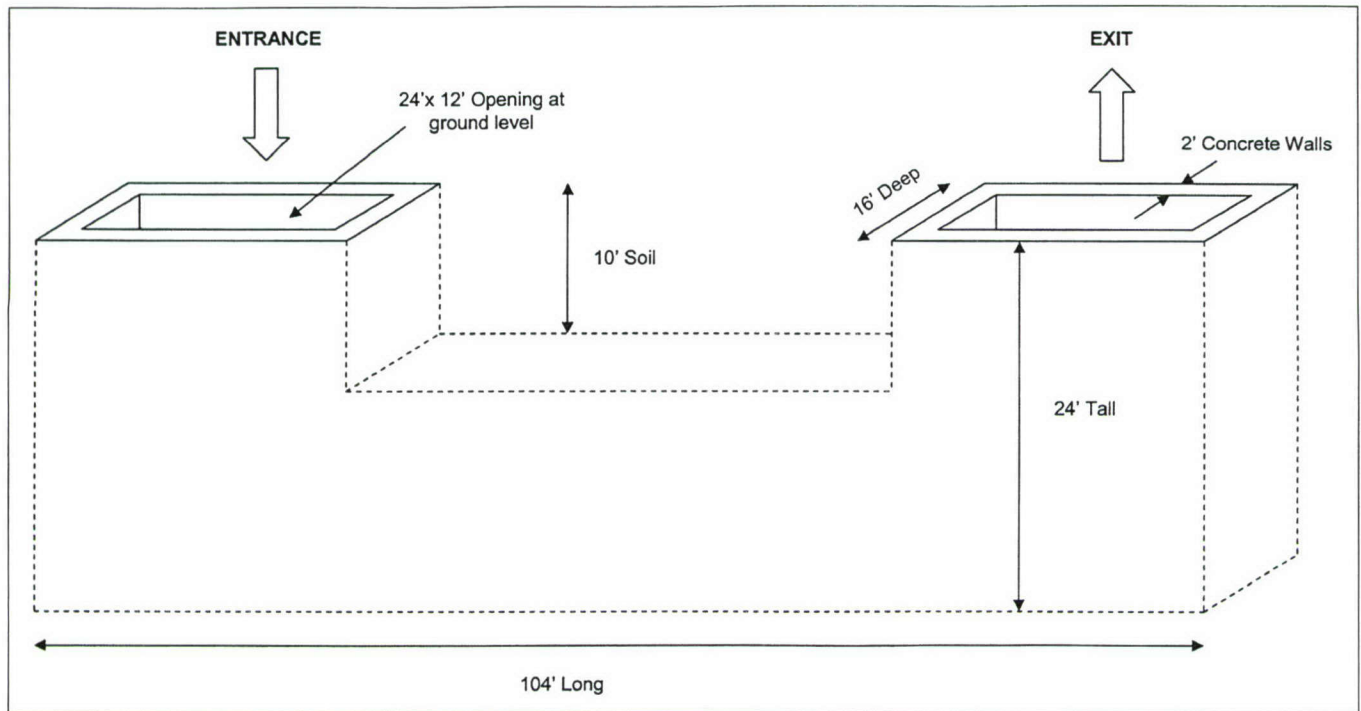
Side perspective of Design C showing outer shape of the underground facility.
